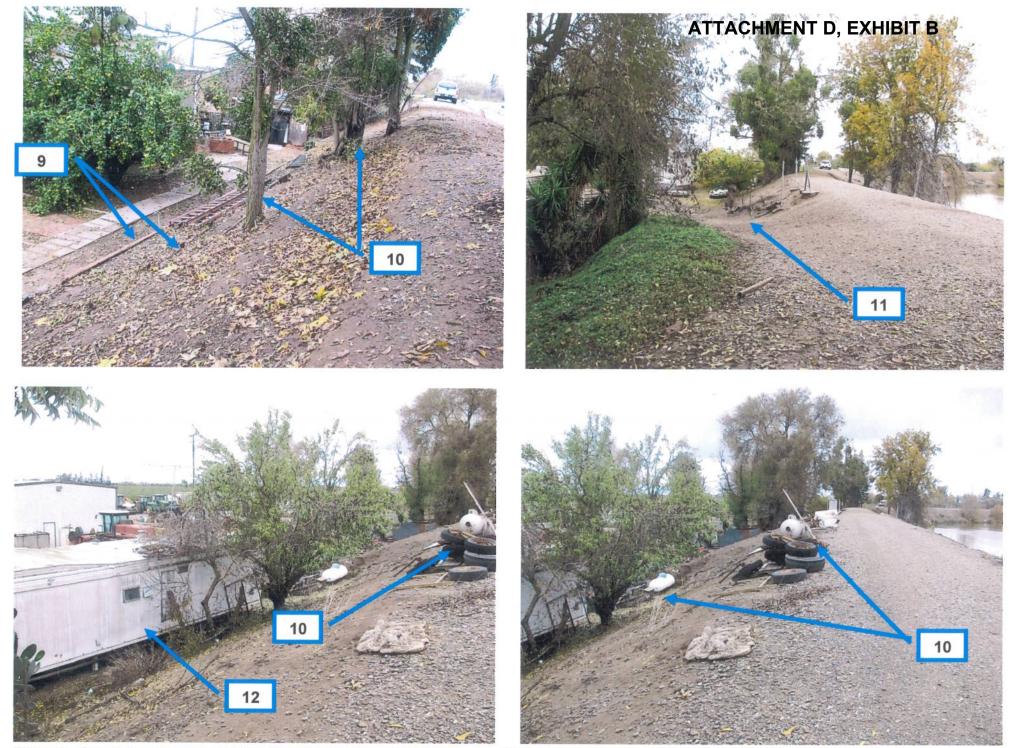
Site visit photos for APN 162-160-03 Dan Roza, T2012110 (source: CVFPB staff site visit on December 6, 2012)
